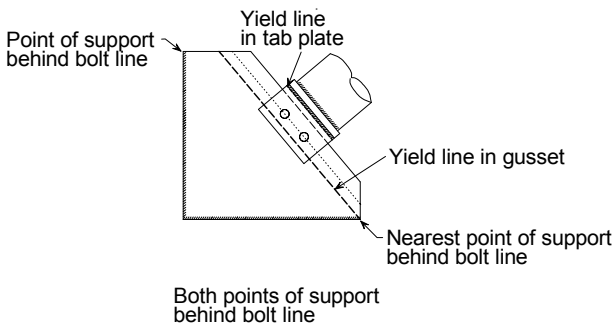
Two bolt connection – both points of support ‘behind’ the bolt line.
